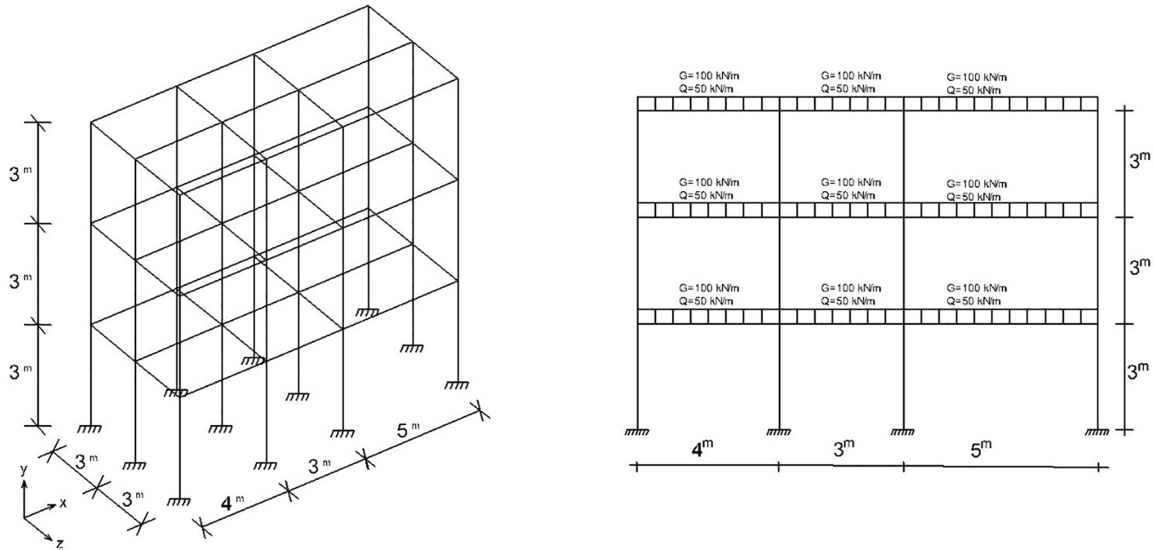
Load distribution and cross-section view of the 3-storey 3-span structure
